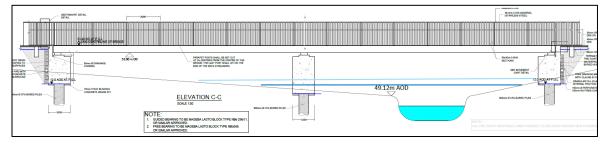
Pedestrian and cycle Bridge 3 Location
